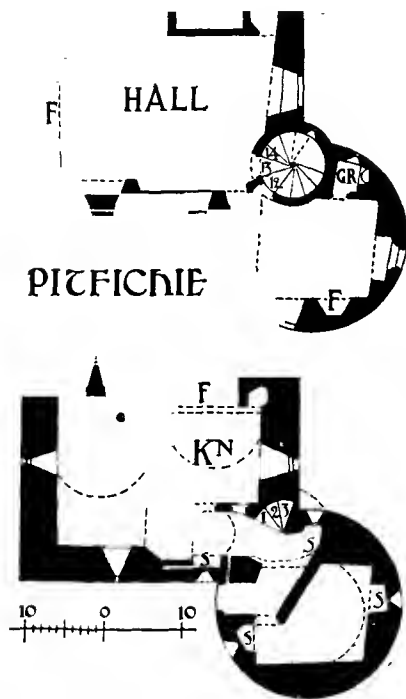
Pitfichie Castle: plans of basement and first floor.
